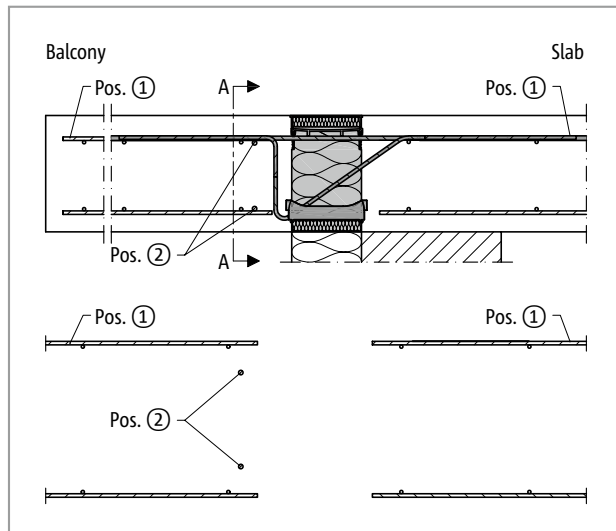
Schöck Isokorb® XT type K-M1 to M10: on-site reinforcement with direct support
